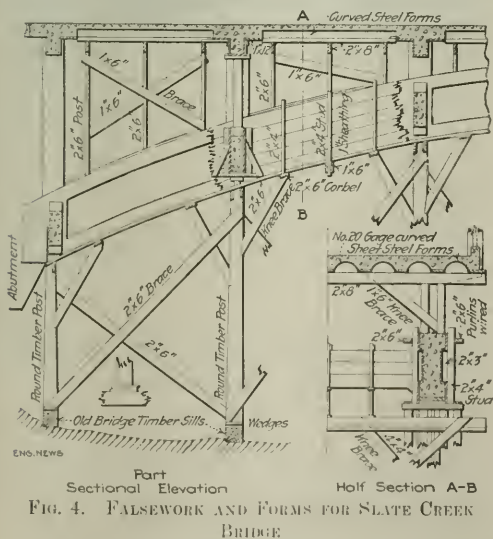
FALSEWORK AND FORMS FOR SLATE CREEK BRIDGE
